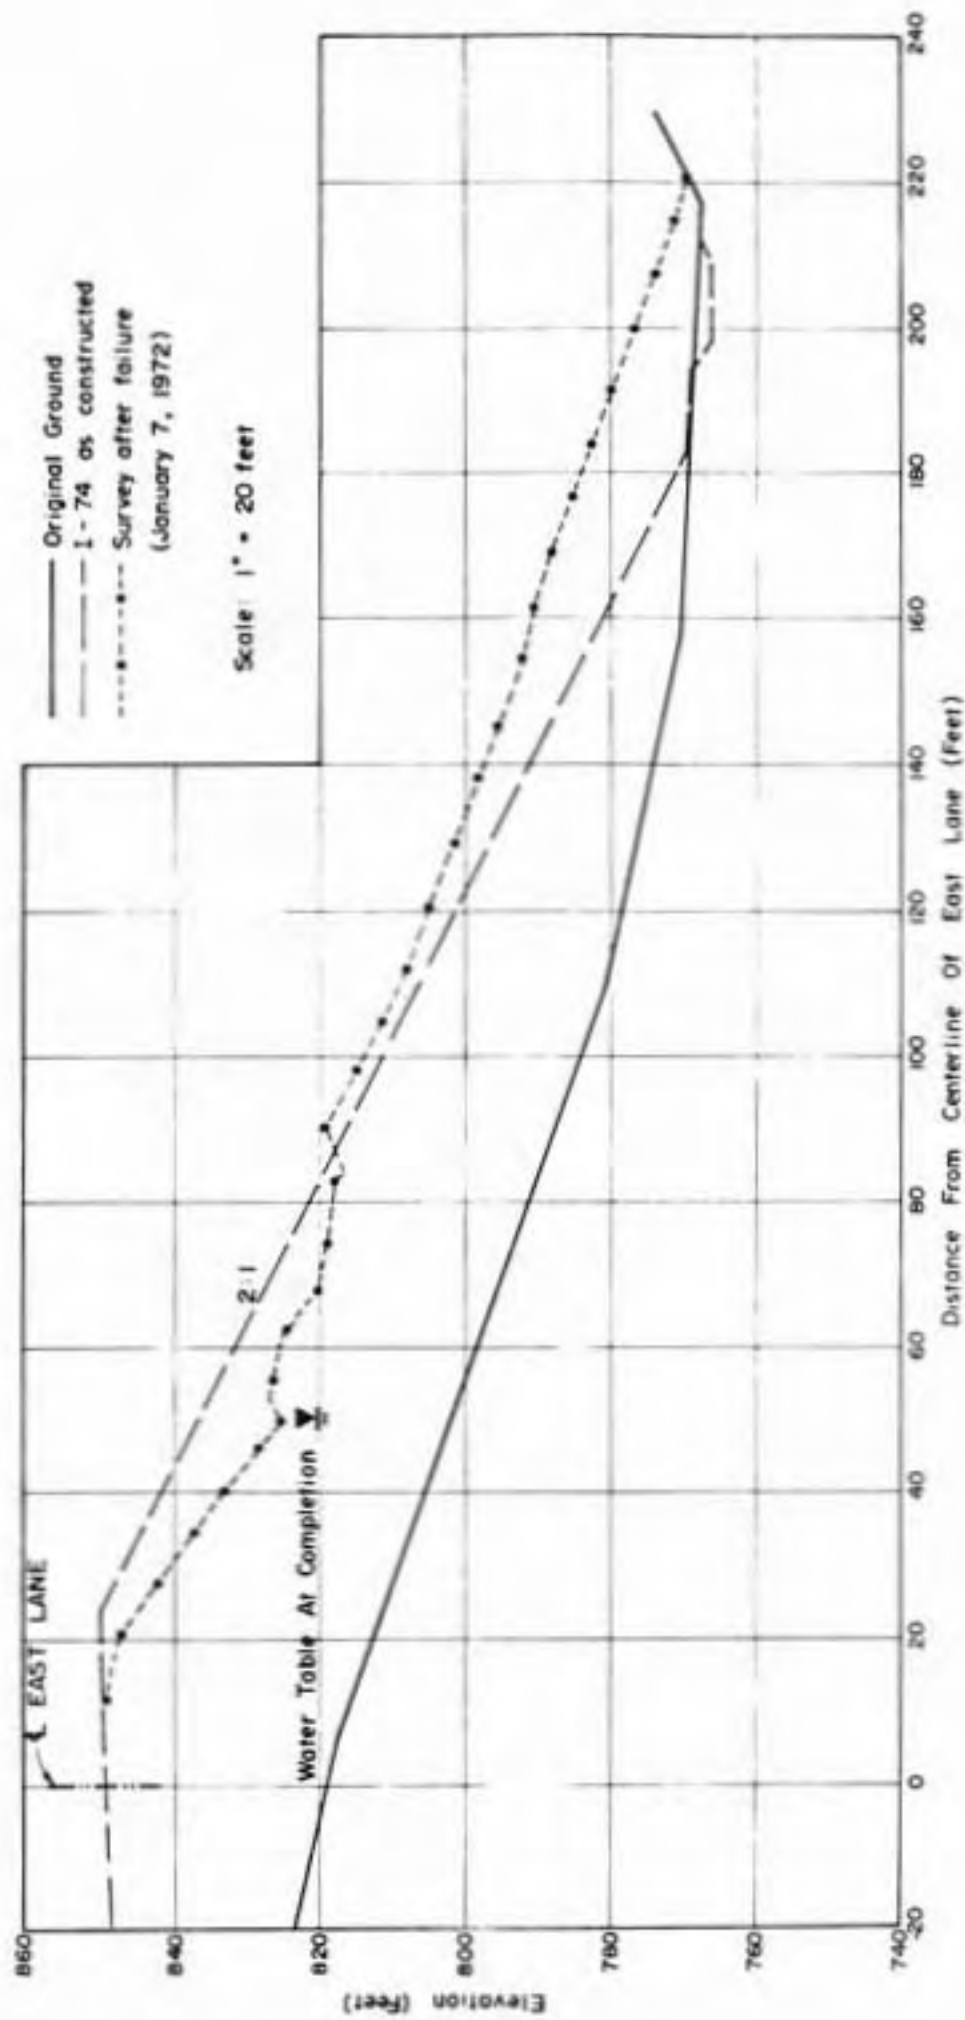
CROSS SECTION OF I-74 EMBANKMENT BEFORE AND AFTER SLOPE FAILURE.
